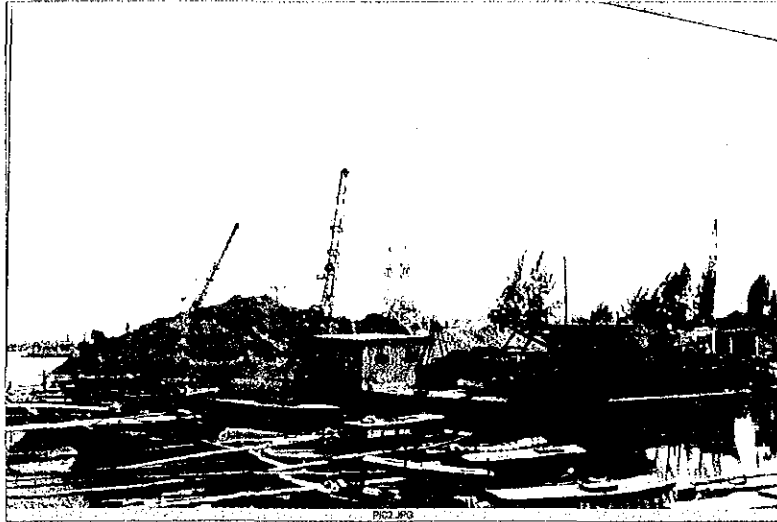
Mekong Ready Mixed Concrete Plant near Cat Lo Fishing Port
